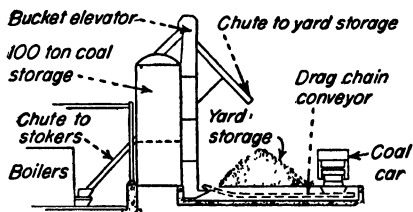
For larger plants requiring outside storage. Provides for direct delivery from railroad cars to elevator and for reclaiming outside storage. Steel plates or planks laid across conveyor pit support outside storage and are removed to permit feed to conveyor.
